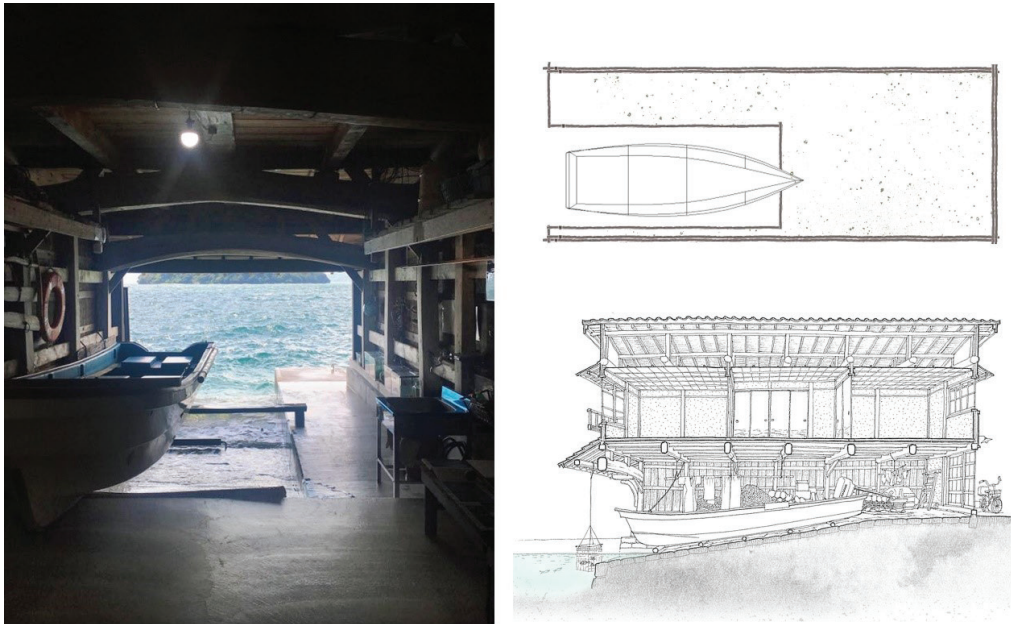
Space inside Funaya, boat space plan at the first floor and section of Funaya
